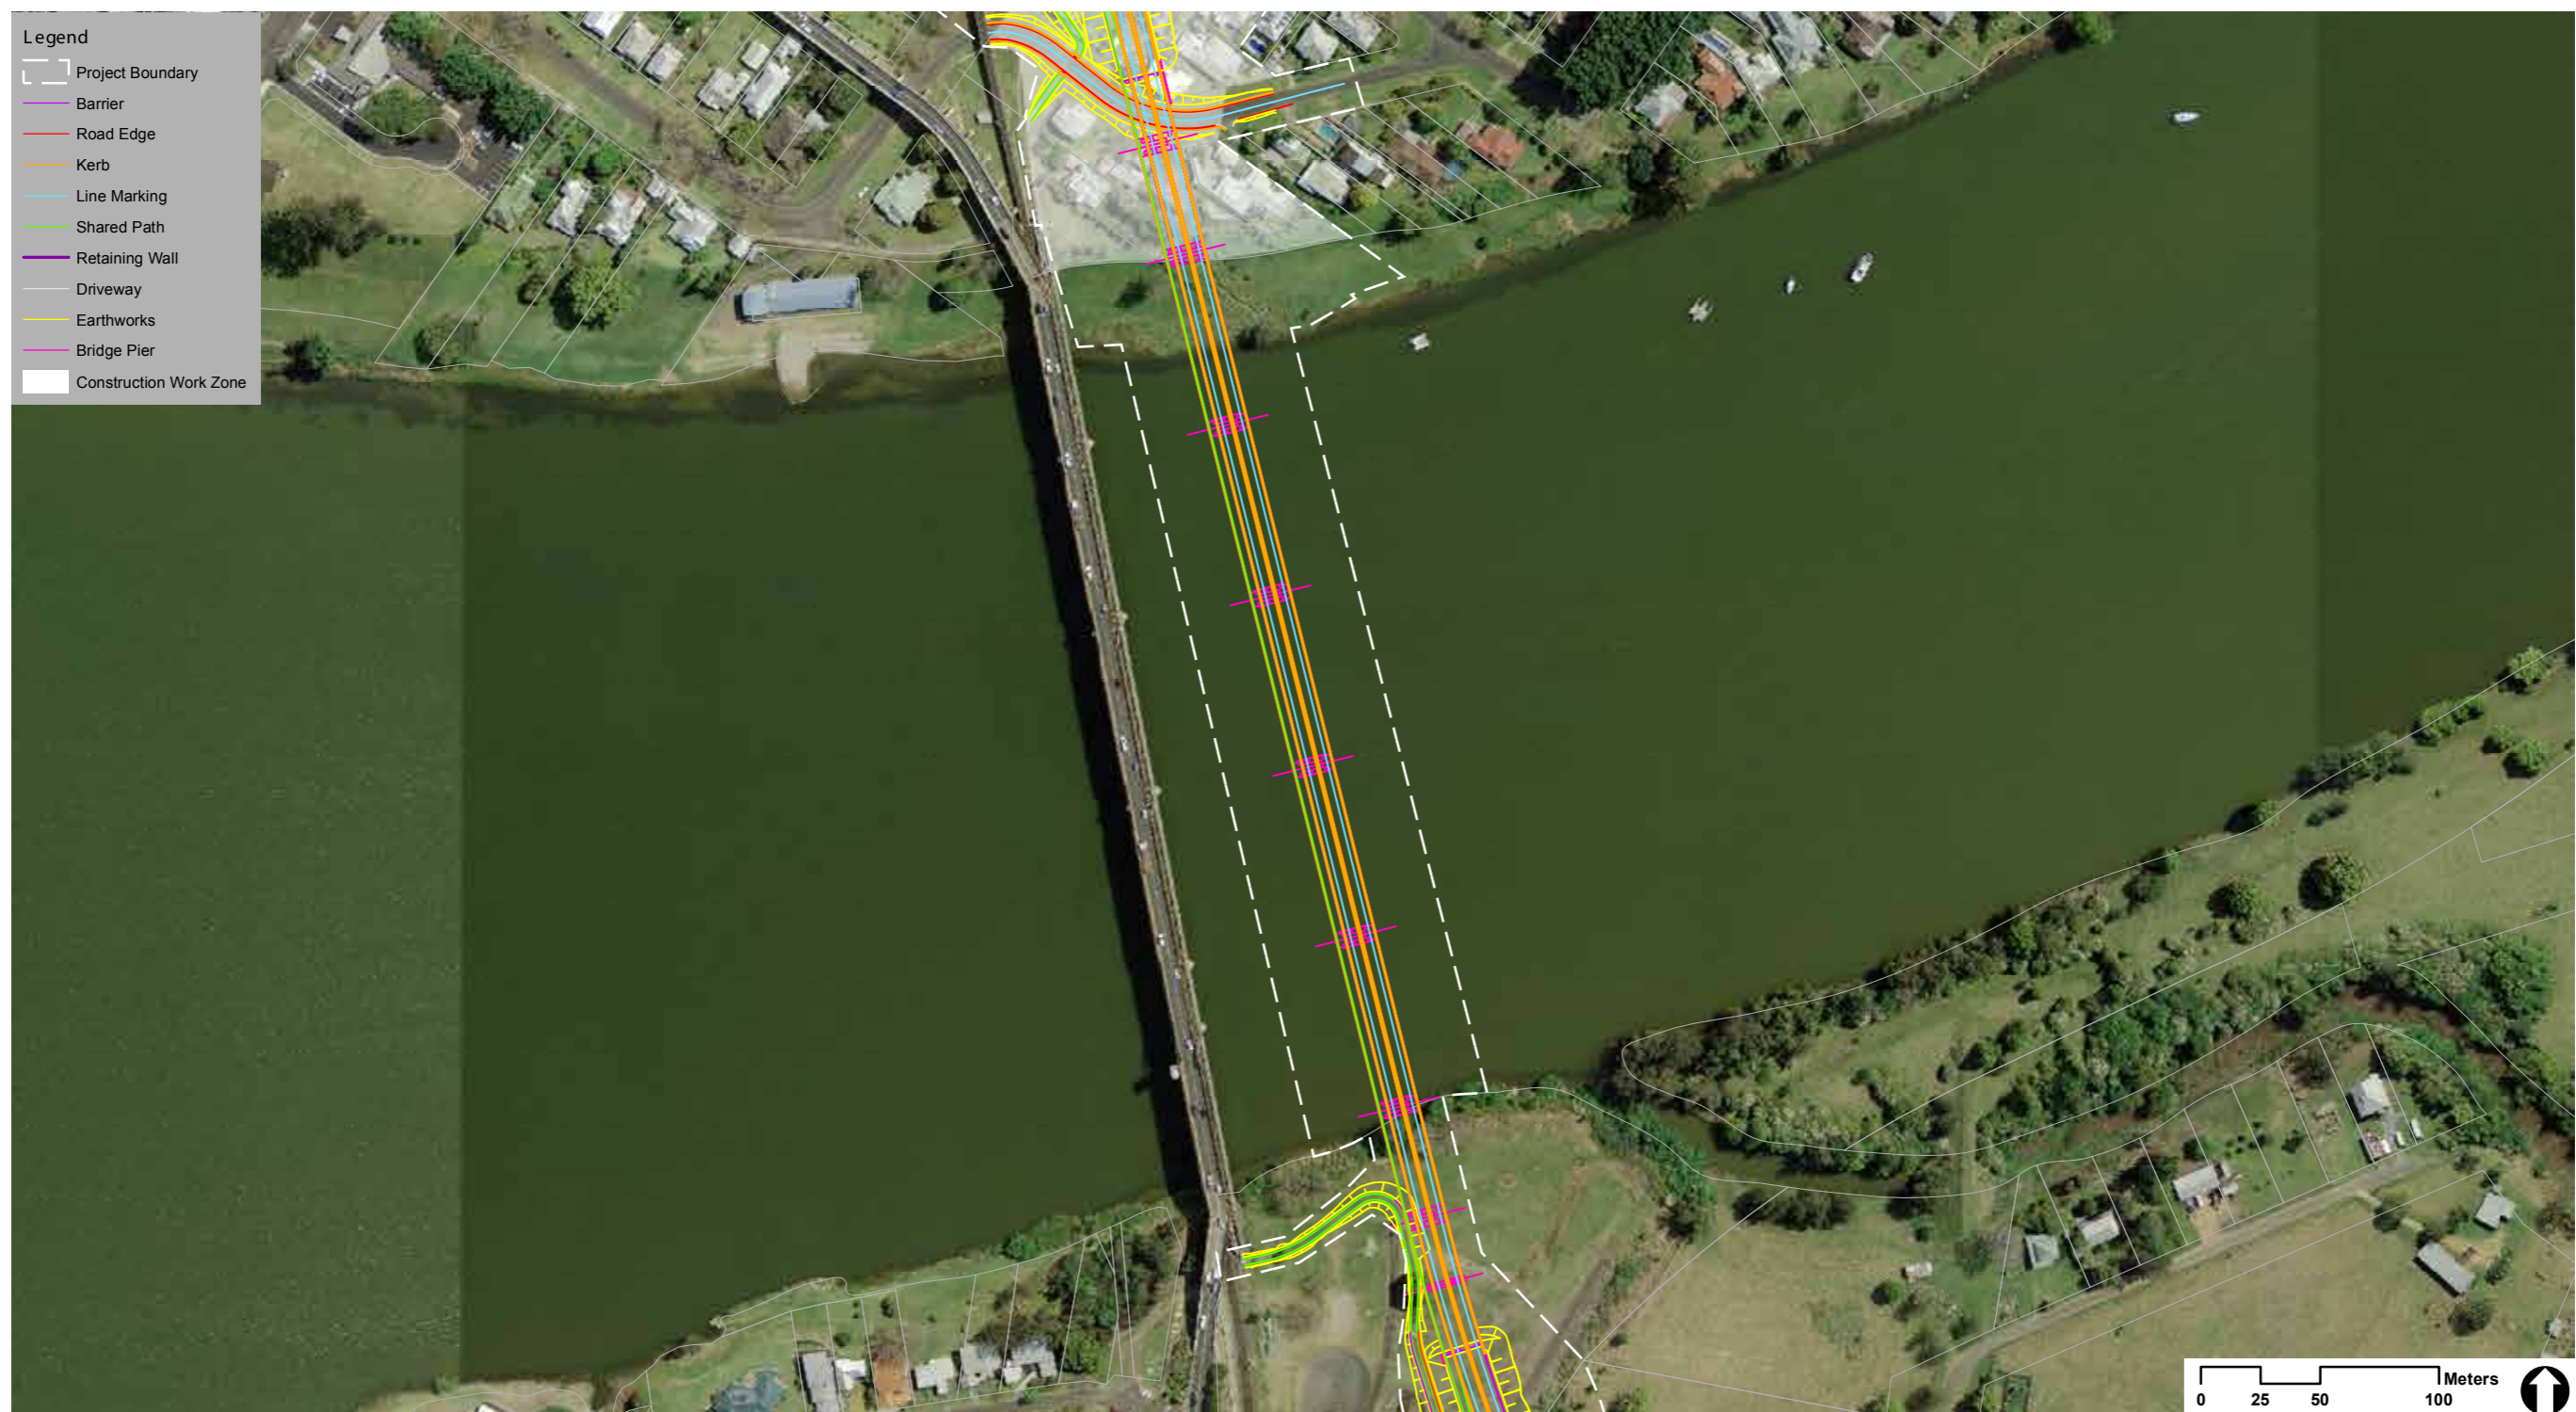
Proposed bridge and road design plan, sheet 3 of 5.
